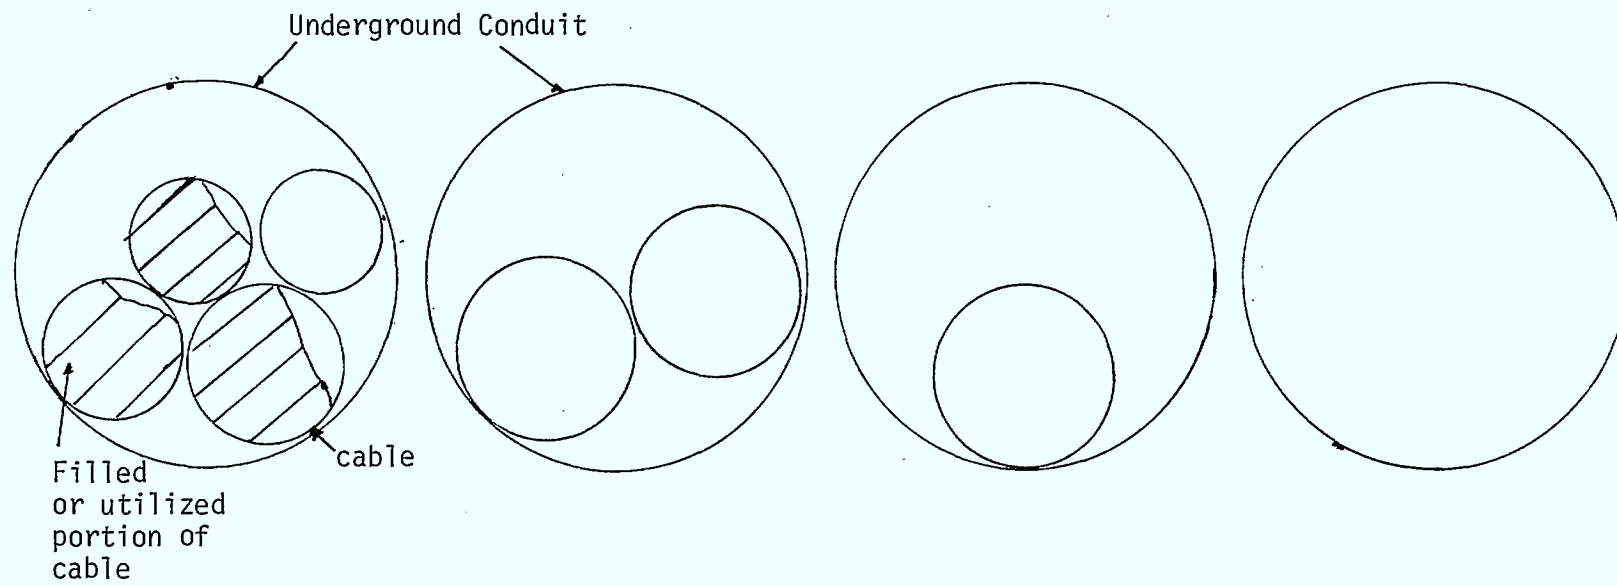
Cable Fill in a Four-Way Underground Conduit
